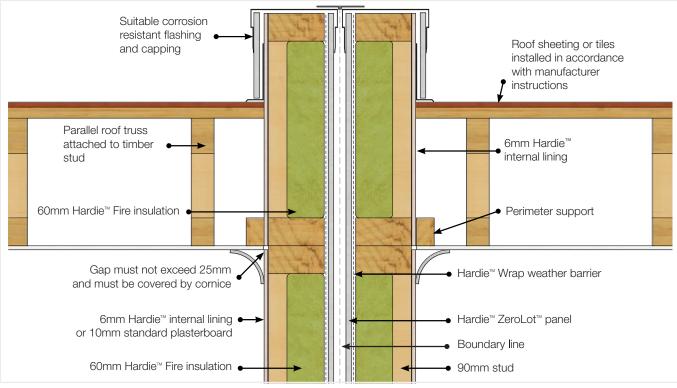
DUAL ZERO LOT PARAPET ROOF WITH PARALLEL ROOF TRUSSES
